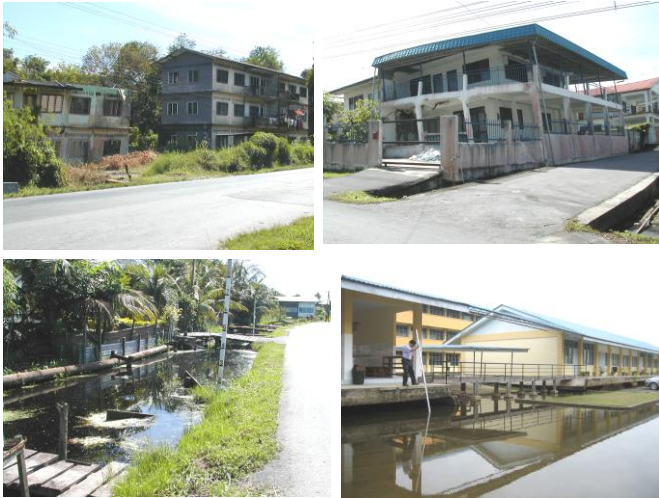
The sinking of Sibu: (clockwise) multi-storey buildings losing the ground floors- subsidence, a 'dancing' house due to non-uniform settlement, road and drain at the same level- excessive subsidence, a 'hanging' school with significant ground loss.
